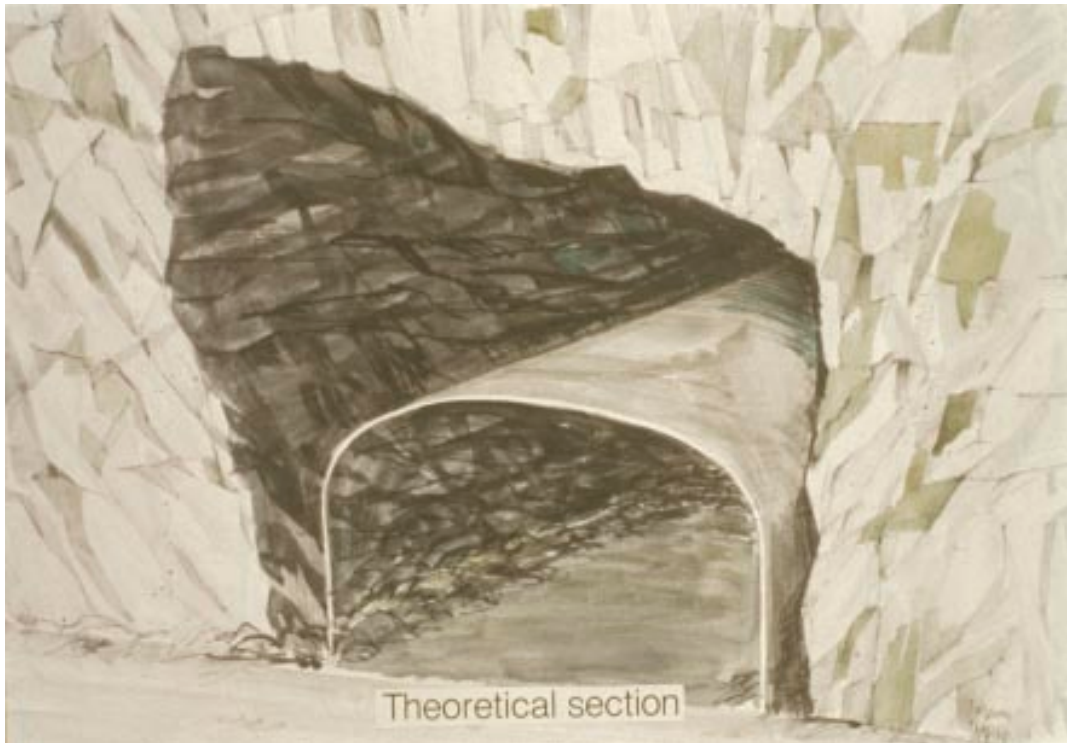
Maximum overbreak amounted to 7.5 m above the theoretical roof of the tunnel; section 2/545 in the Singö deformation zone, Forsmark 3 tunnel. The artist's view of the overbreak should be seen in the direction of driving. /Carlsson and Olsson 1983/.
